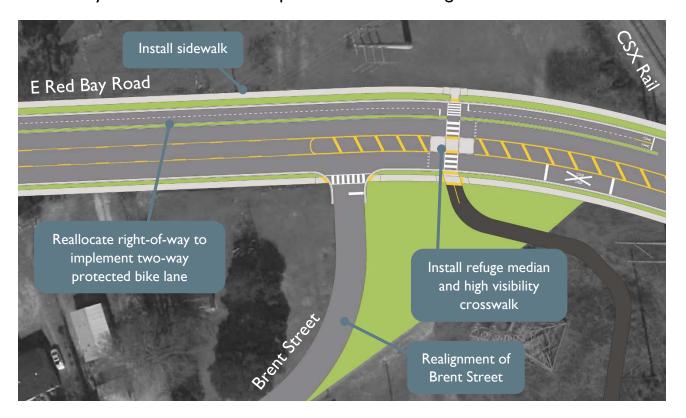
| E. Red Bay Road/Brent Street Intersection Conceptual Improvement
